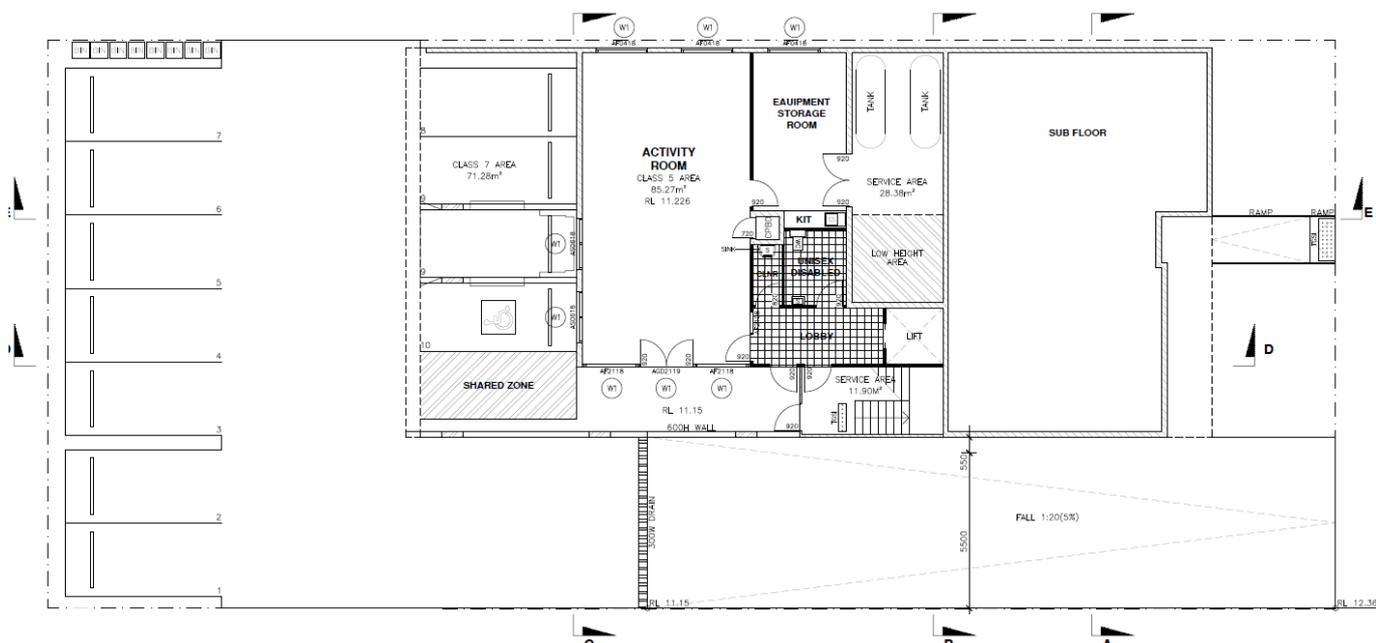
Extract of plans, basement level (Source: Craig Johnson Design)
